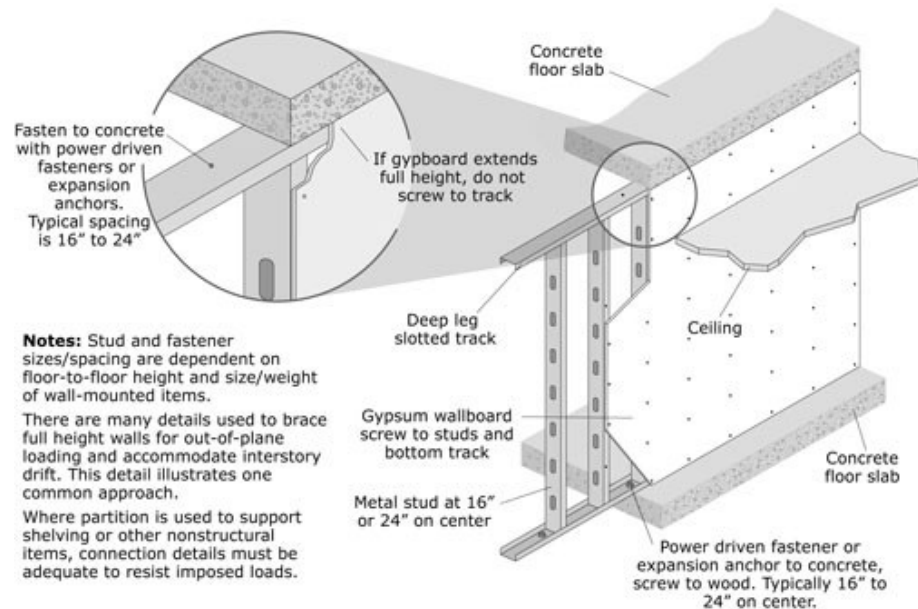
Seismic bracing for full-height lightweight steel gypsum board partition walls (FEMA, 2011)
